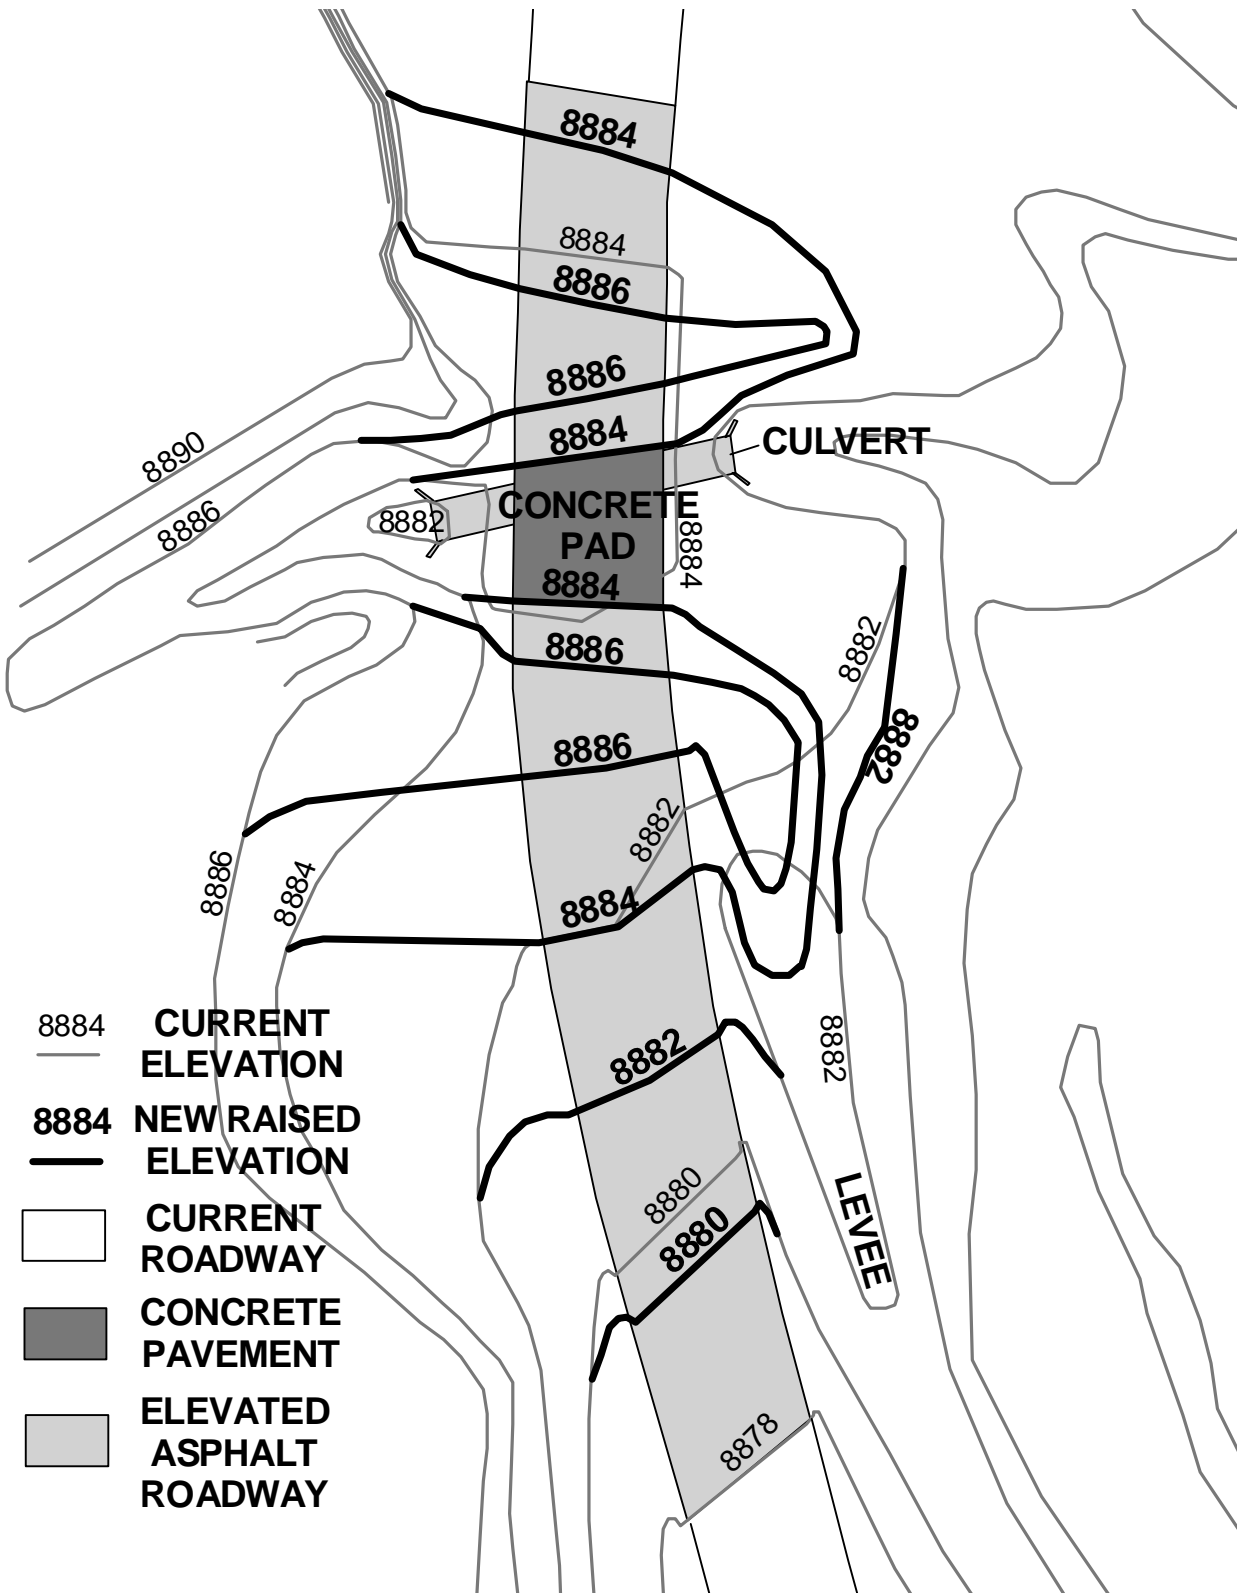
Plan view of Windy Gulch flood overflow
